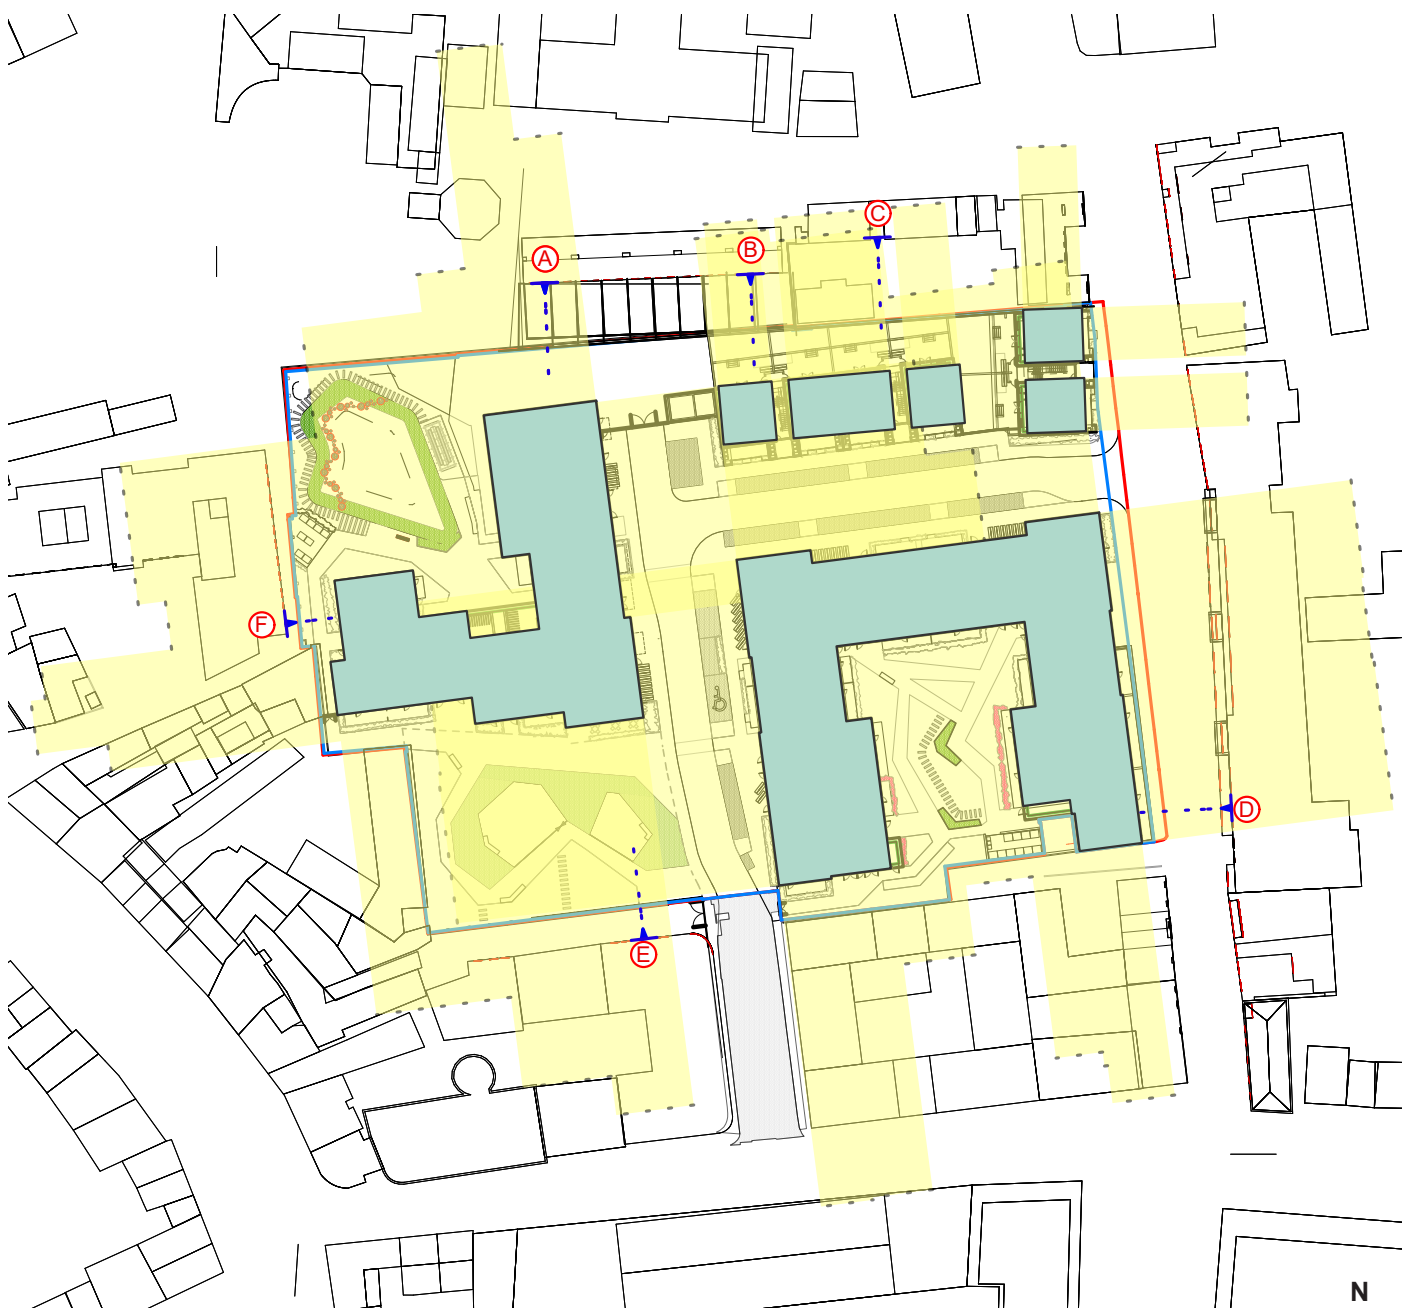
Proposed site plan showing the zone of influence (3 times the height of the proposed building) and direction of the window wall of adjacent residential properties.
